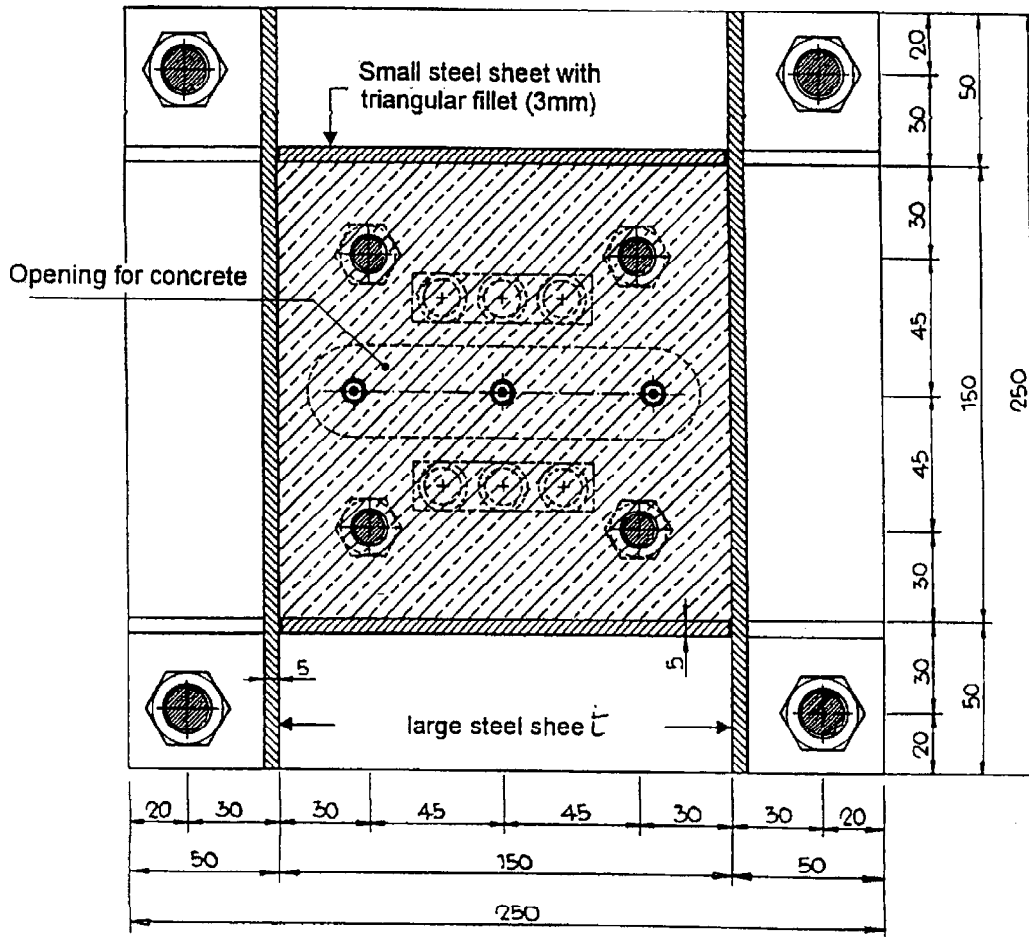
Formwork (side view, cut A-A, dimensions in mm).
